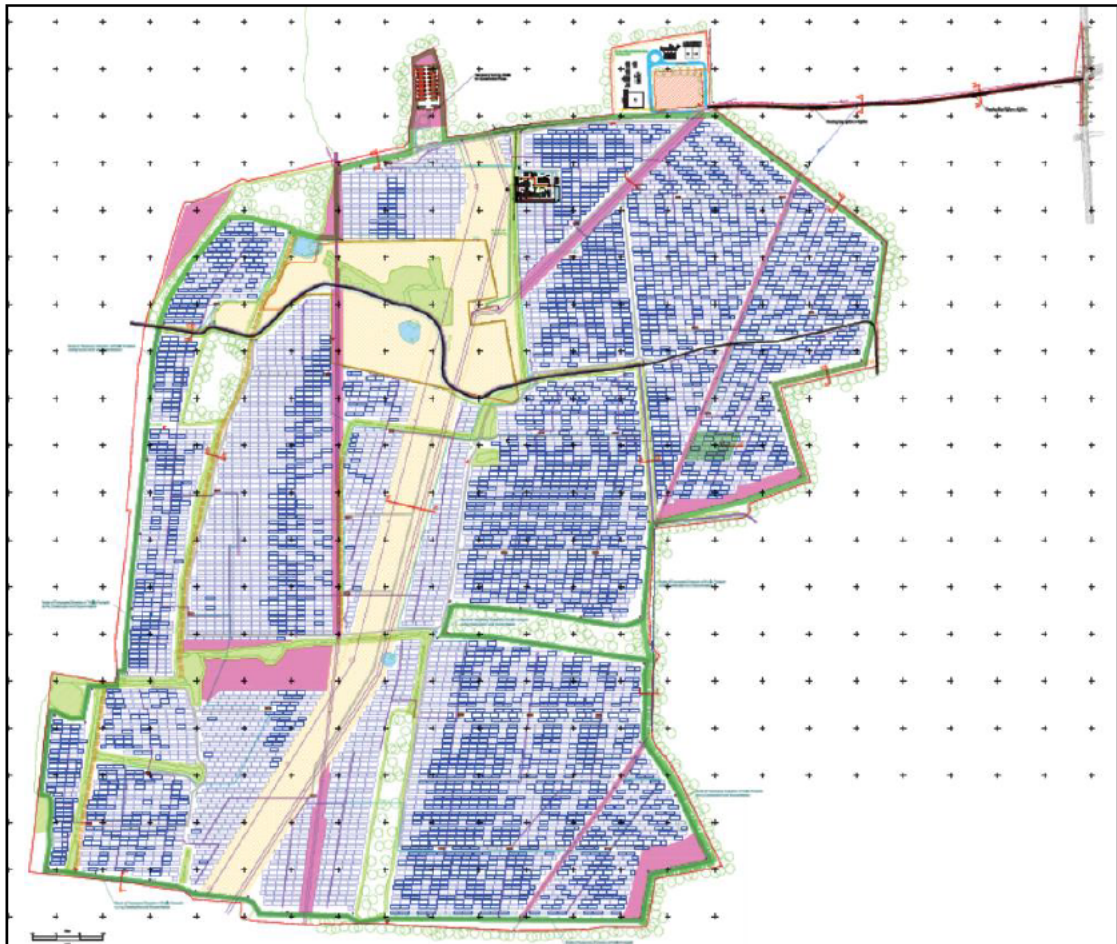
Extract from Work Details - Whole Site Plan (APP-015)
